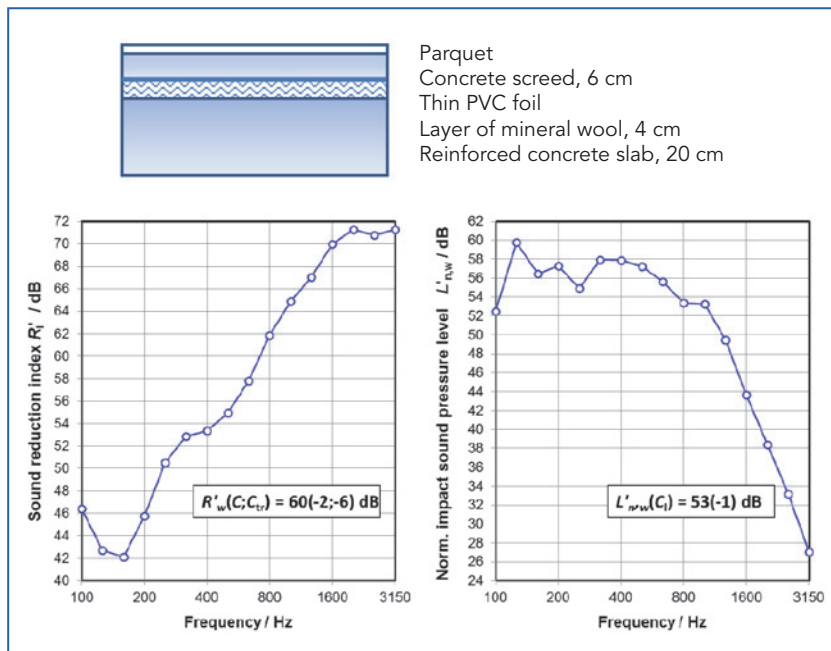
Case study: an example of airborne and impact sound insulation performance of typical massive floor construction between adjoining dwellings in the newbuild apartment block.
